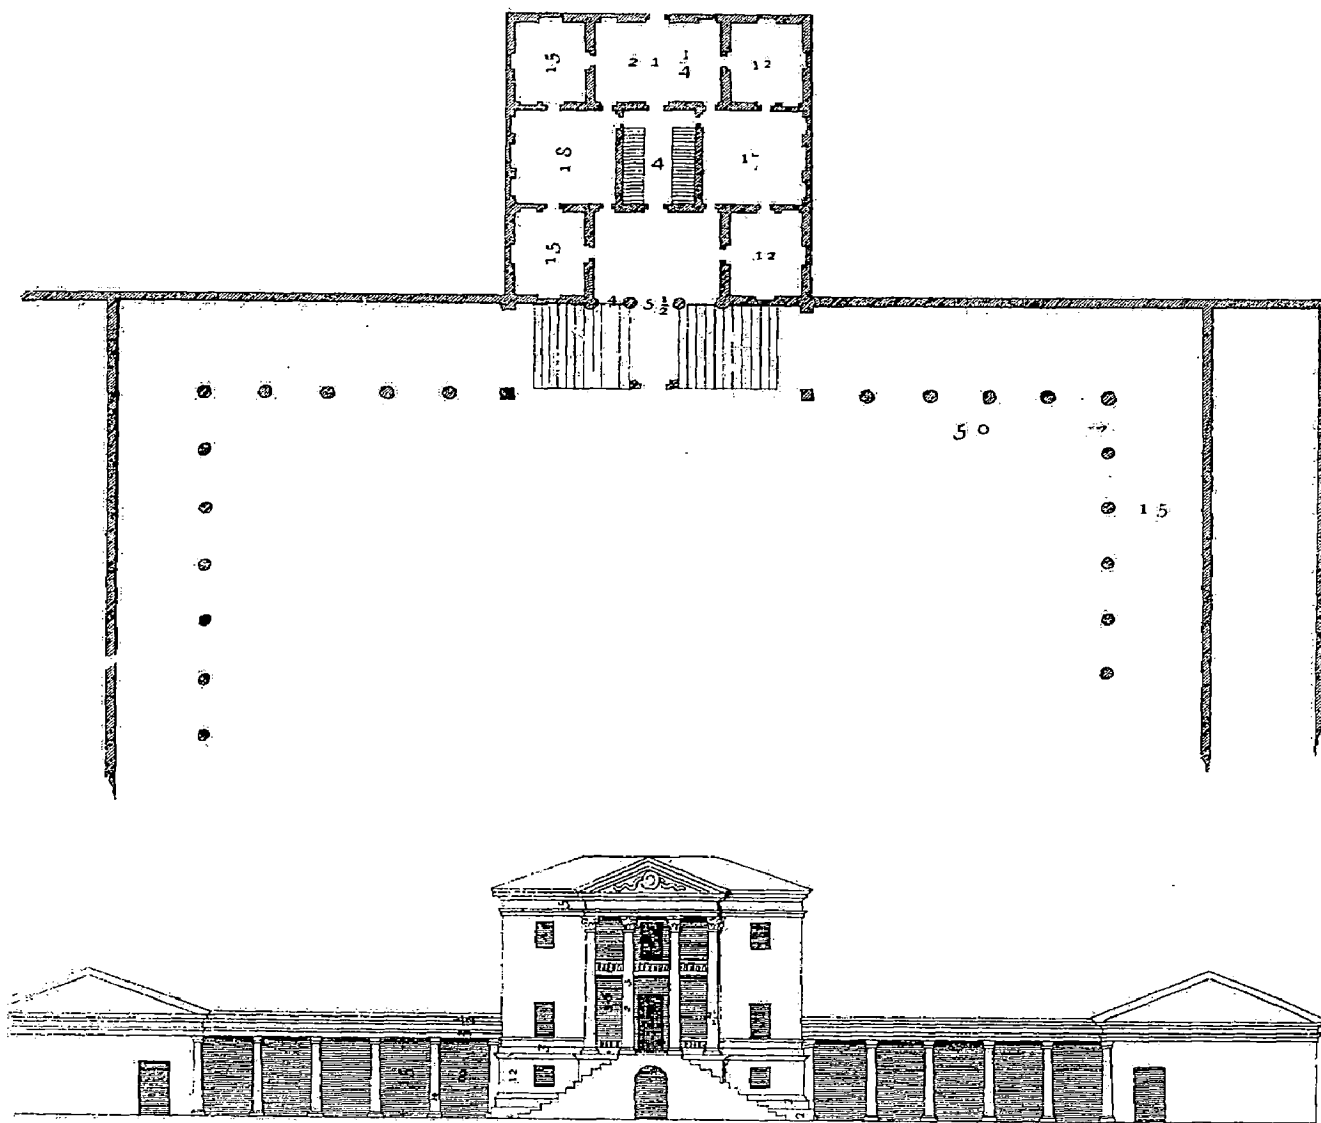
Villa Gioralmo Ragona at Ghizzole in plan and elevation
